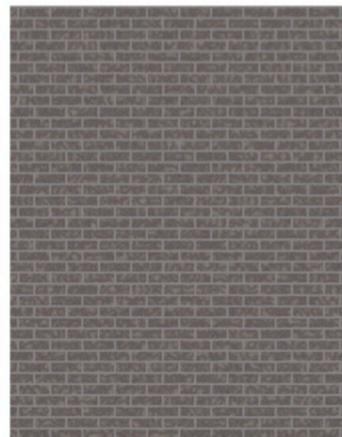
PHOTO OF BRICK AT MARKET PLACE 303 DETROIT STREET
